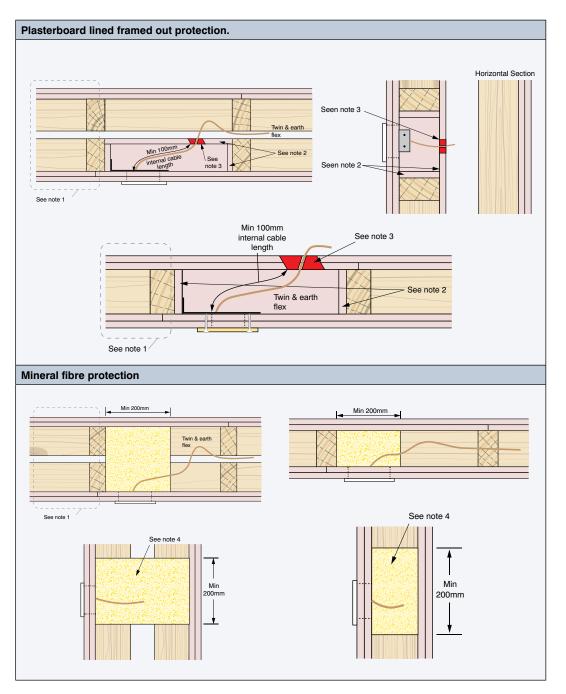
Generic GPO protection systems in timber-framed construction.
